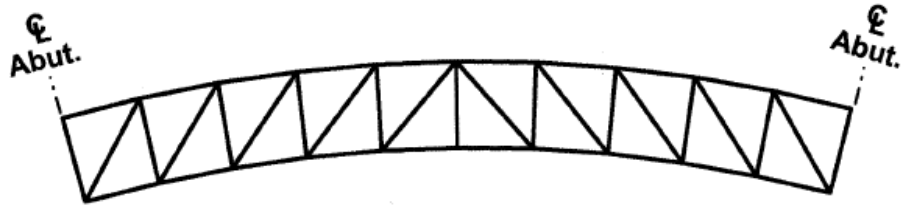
Plan View of a Pratt-type truss lateral bracing system
